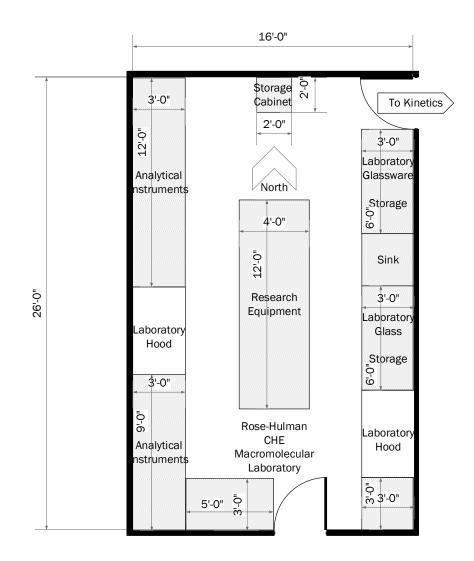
Macromolecular Laboratory (O-204) Floor Plan
